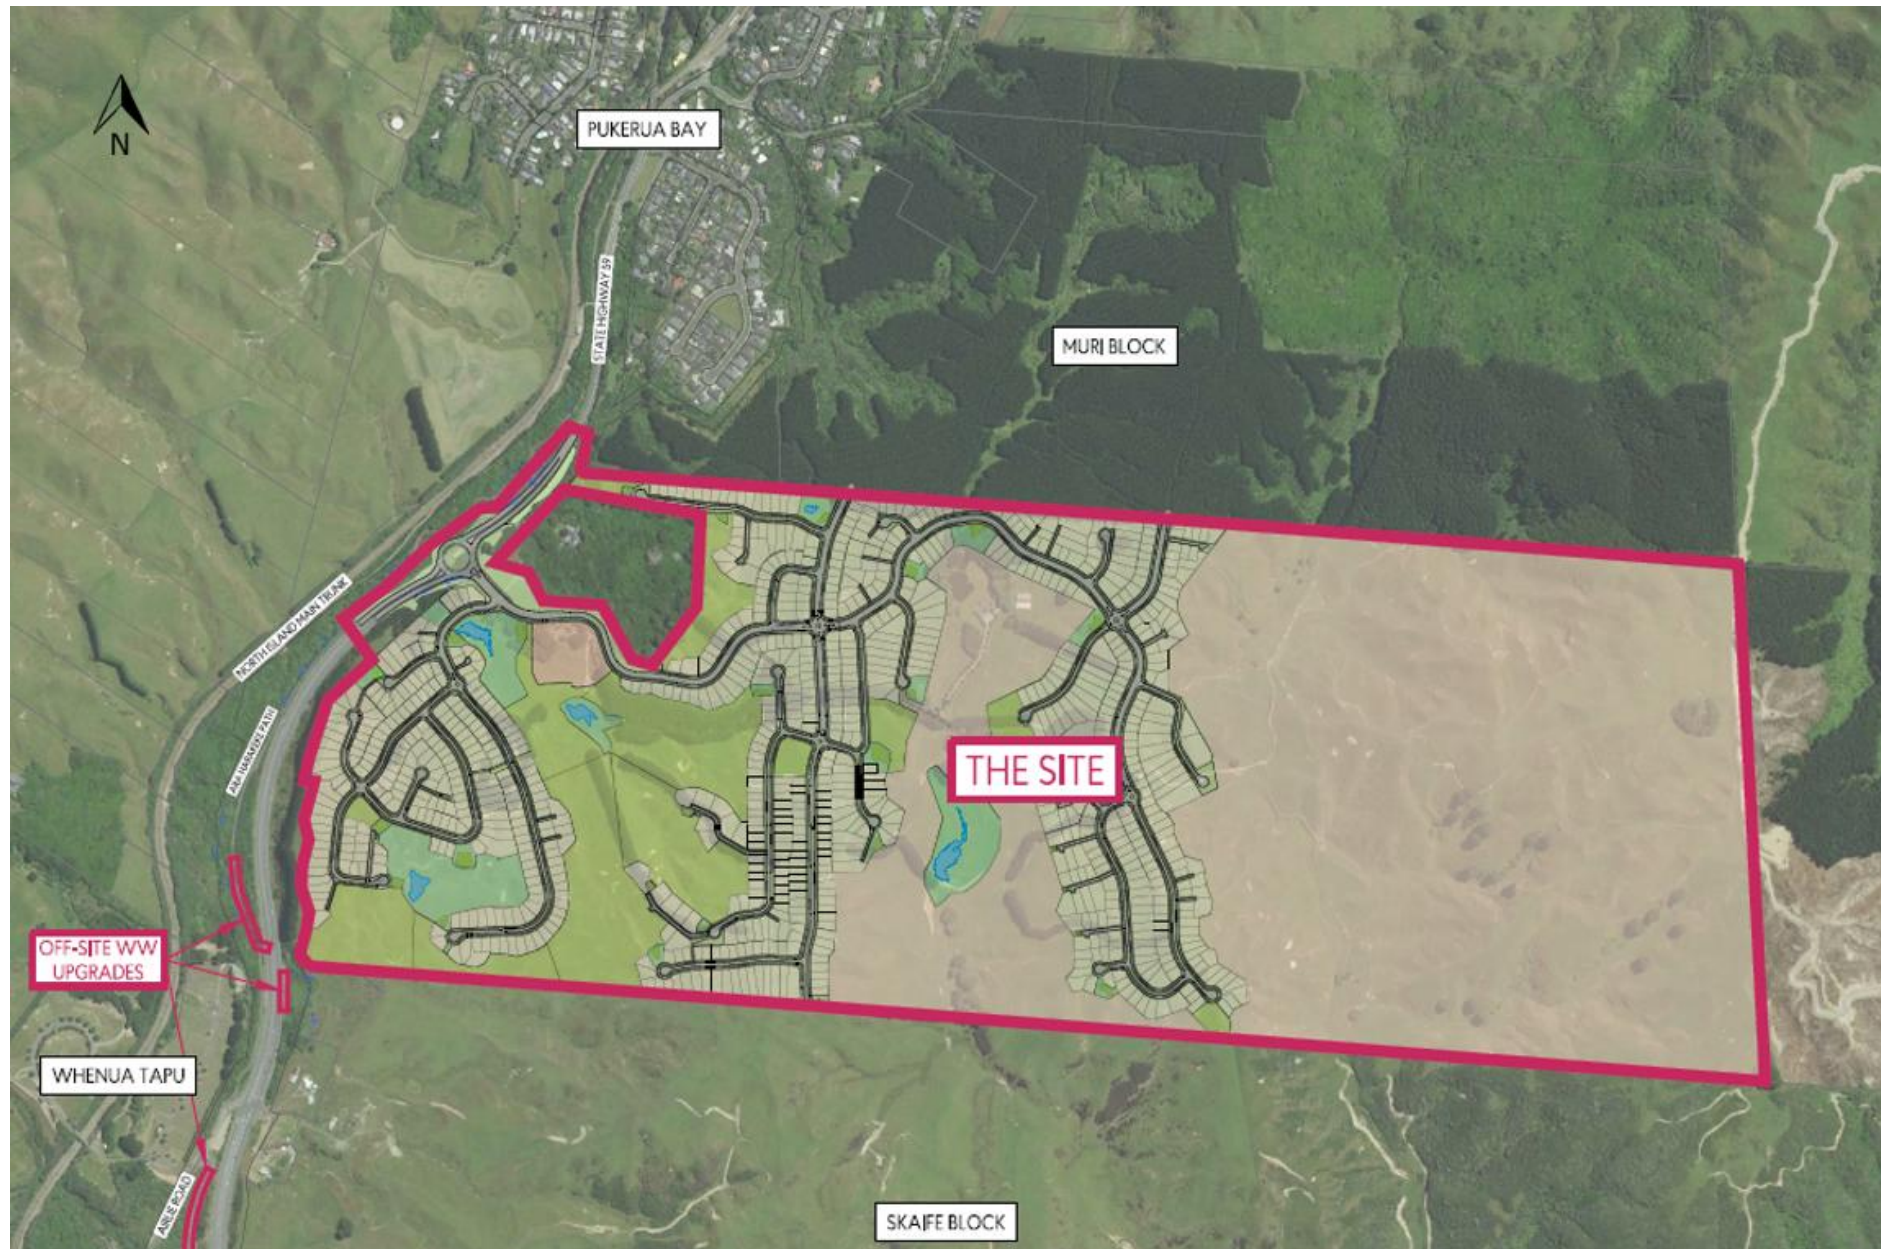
Annotated overview plan of the Mt Welcome Station Subdivision Development construction works project area, Pukerua Bay, Porirua.
